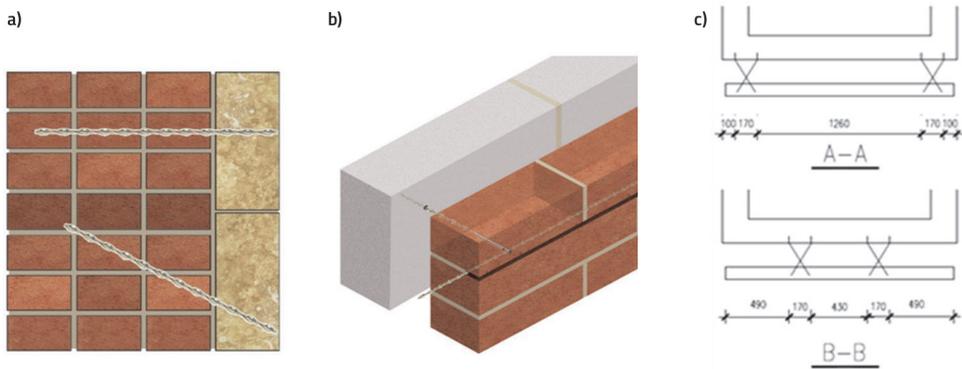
a) Helical bar used to pin masonry. b) Stainless steel connector. c) 'Ductile' anchors
